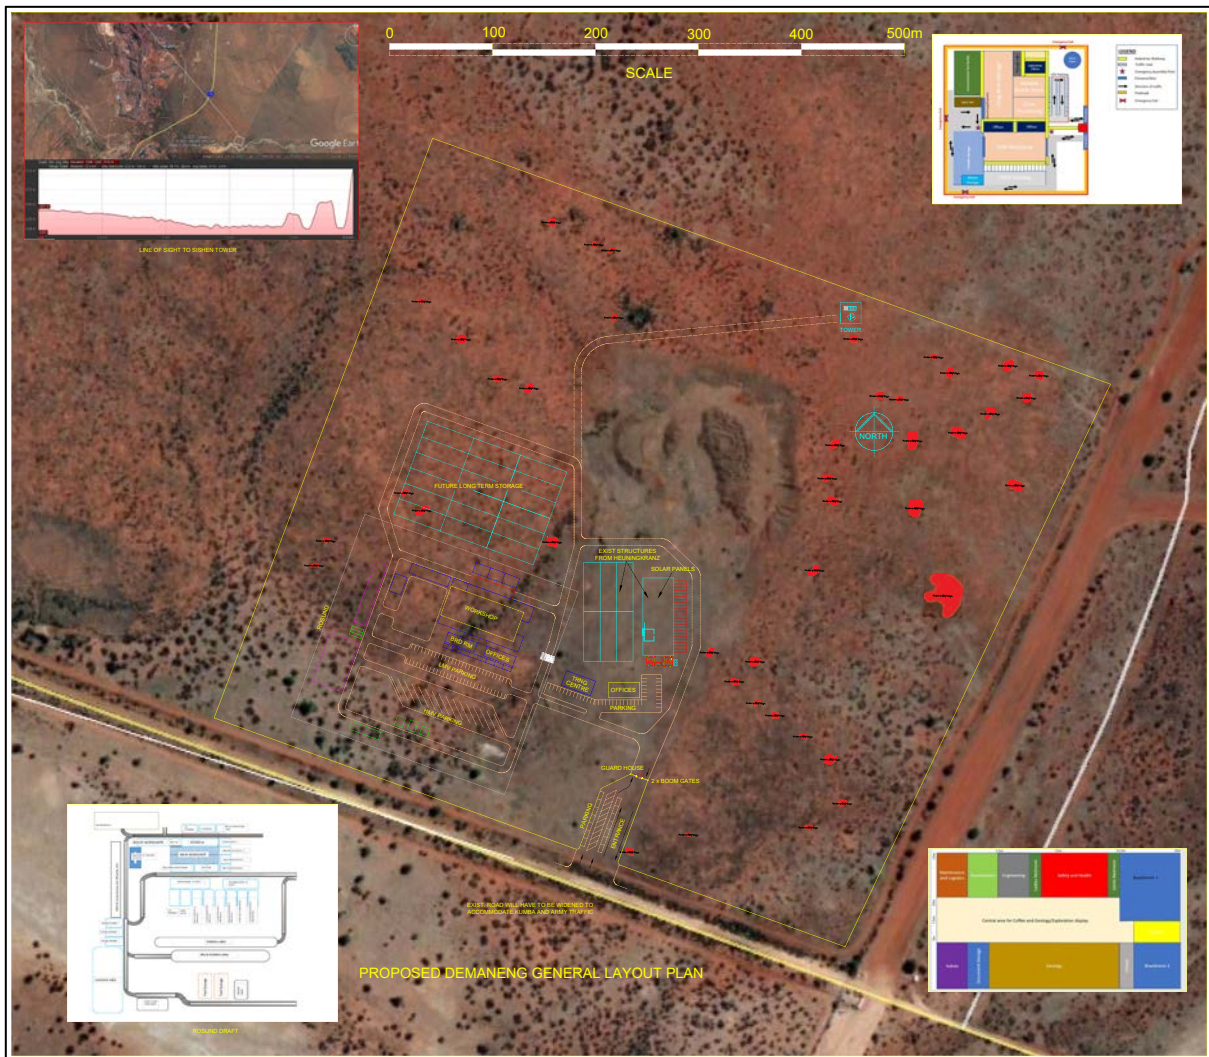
Proposed development layout plan. This plan was provided by the client (PGS 2021: 45).
